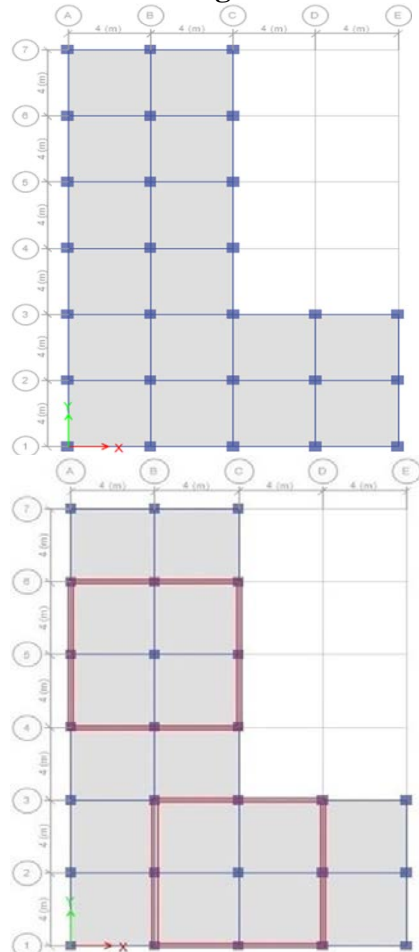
Plan of irregular structure L2 representing bare frame and frame with bracings and infill walls
